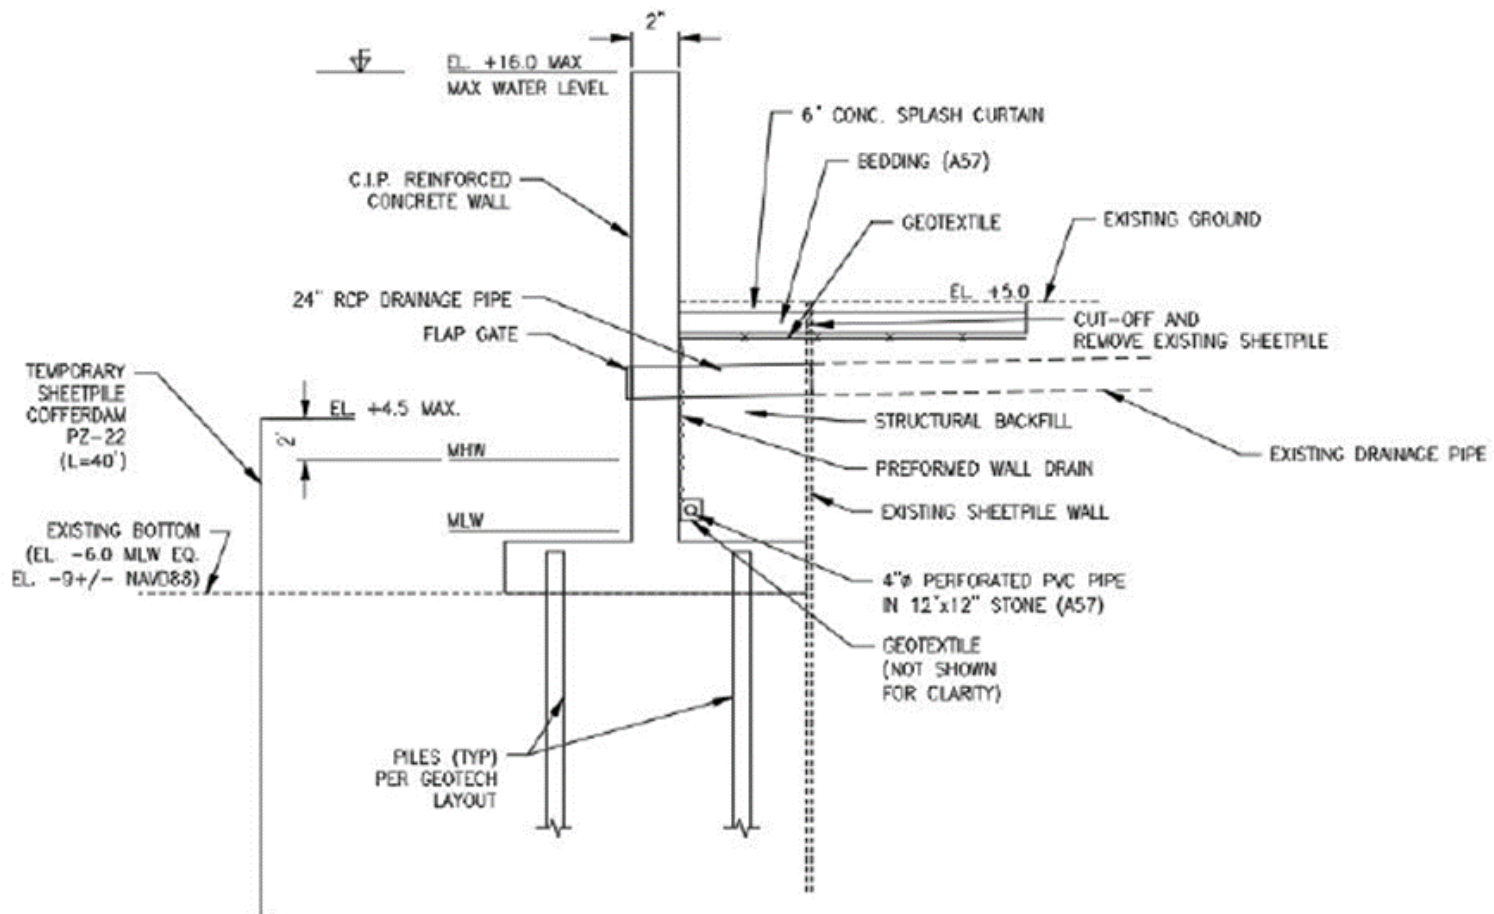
Typical Section Type B Concrete Cantilever Floodwall on Piles (Perimeter Plans)
